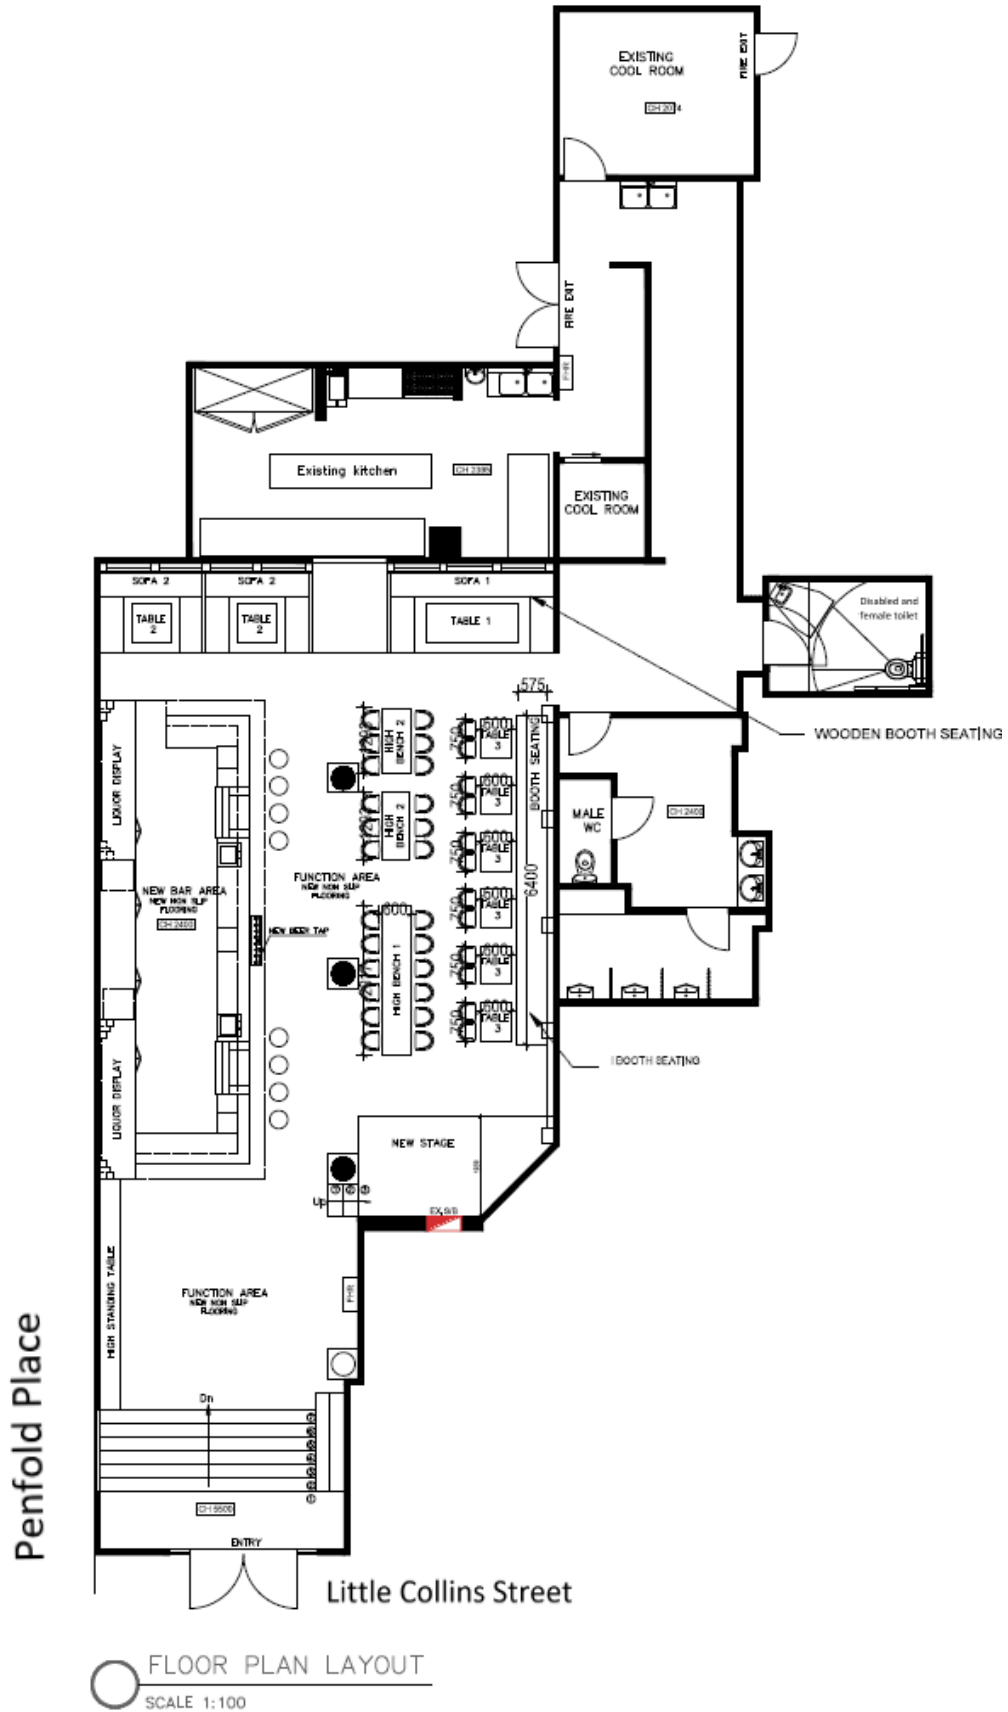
Proposed Floor Layout (Source: Applicant's submission material)
